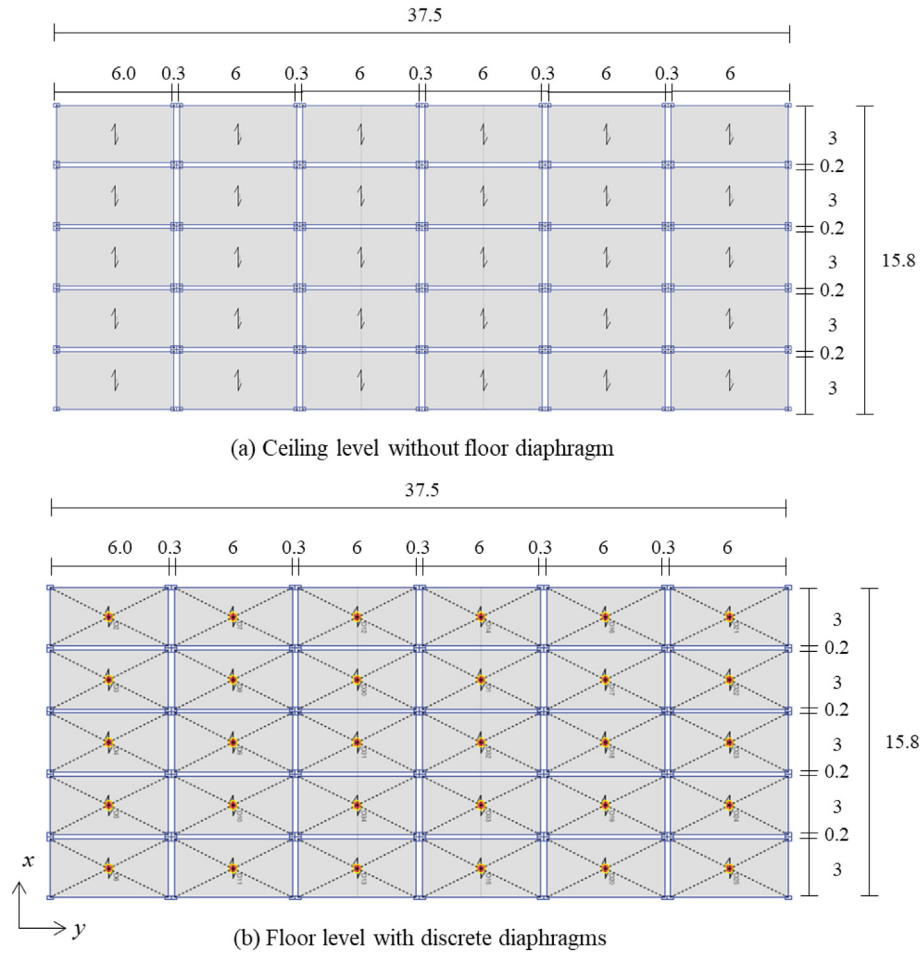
Plan view of 10-storey unbraced modular building (a) ceiling level, and (b) floor level (all units in m).
